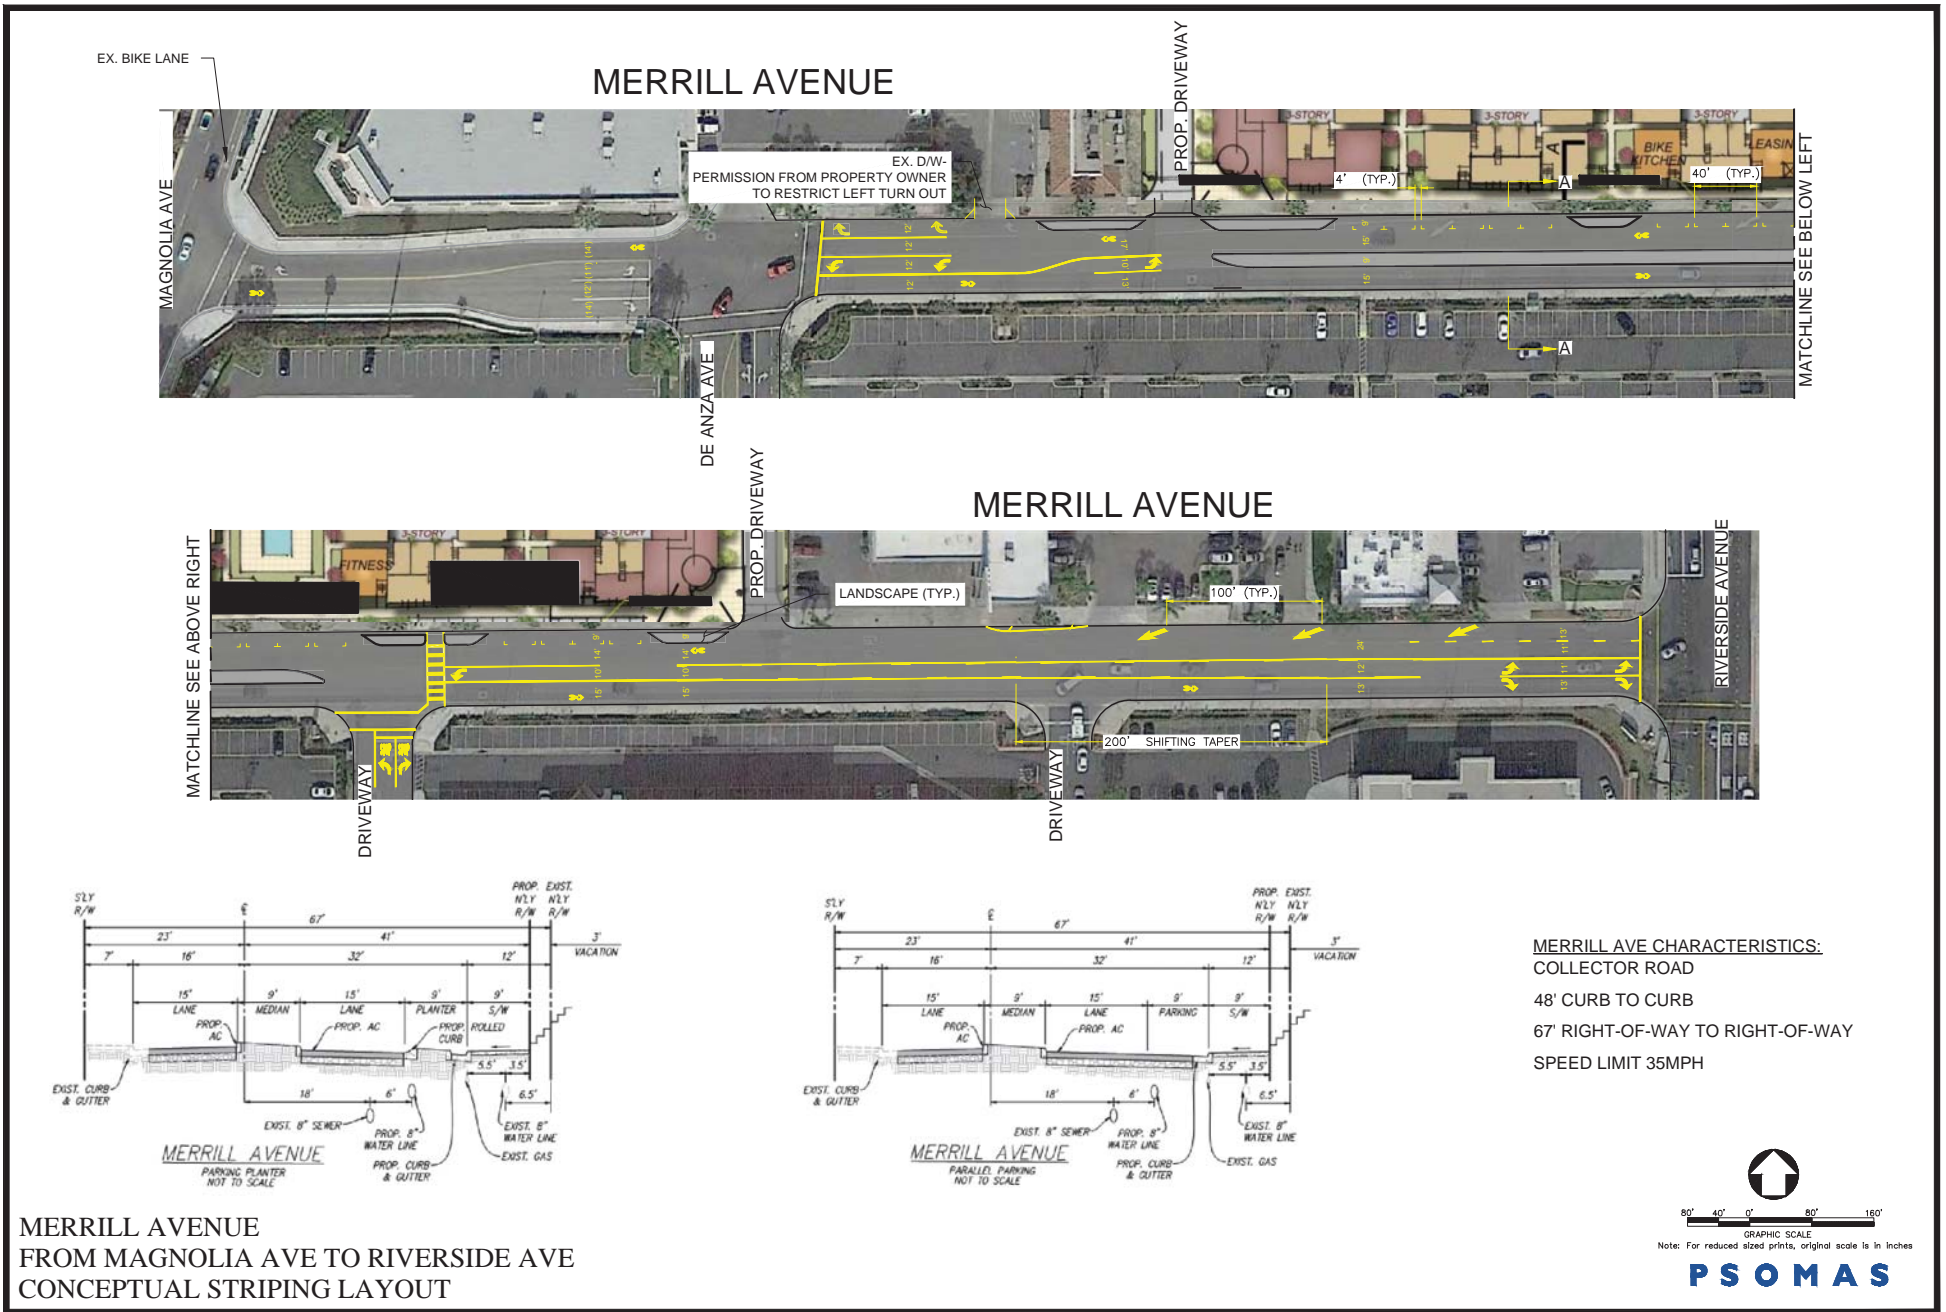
Project Plans (Merrill Avenue Street Section)
